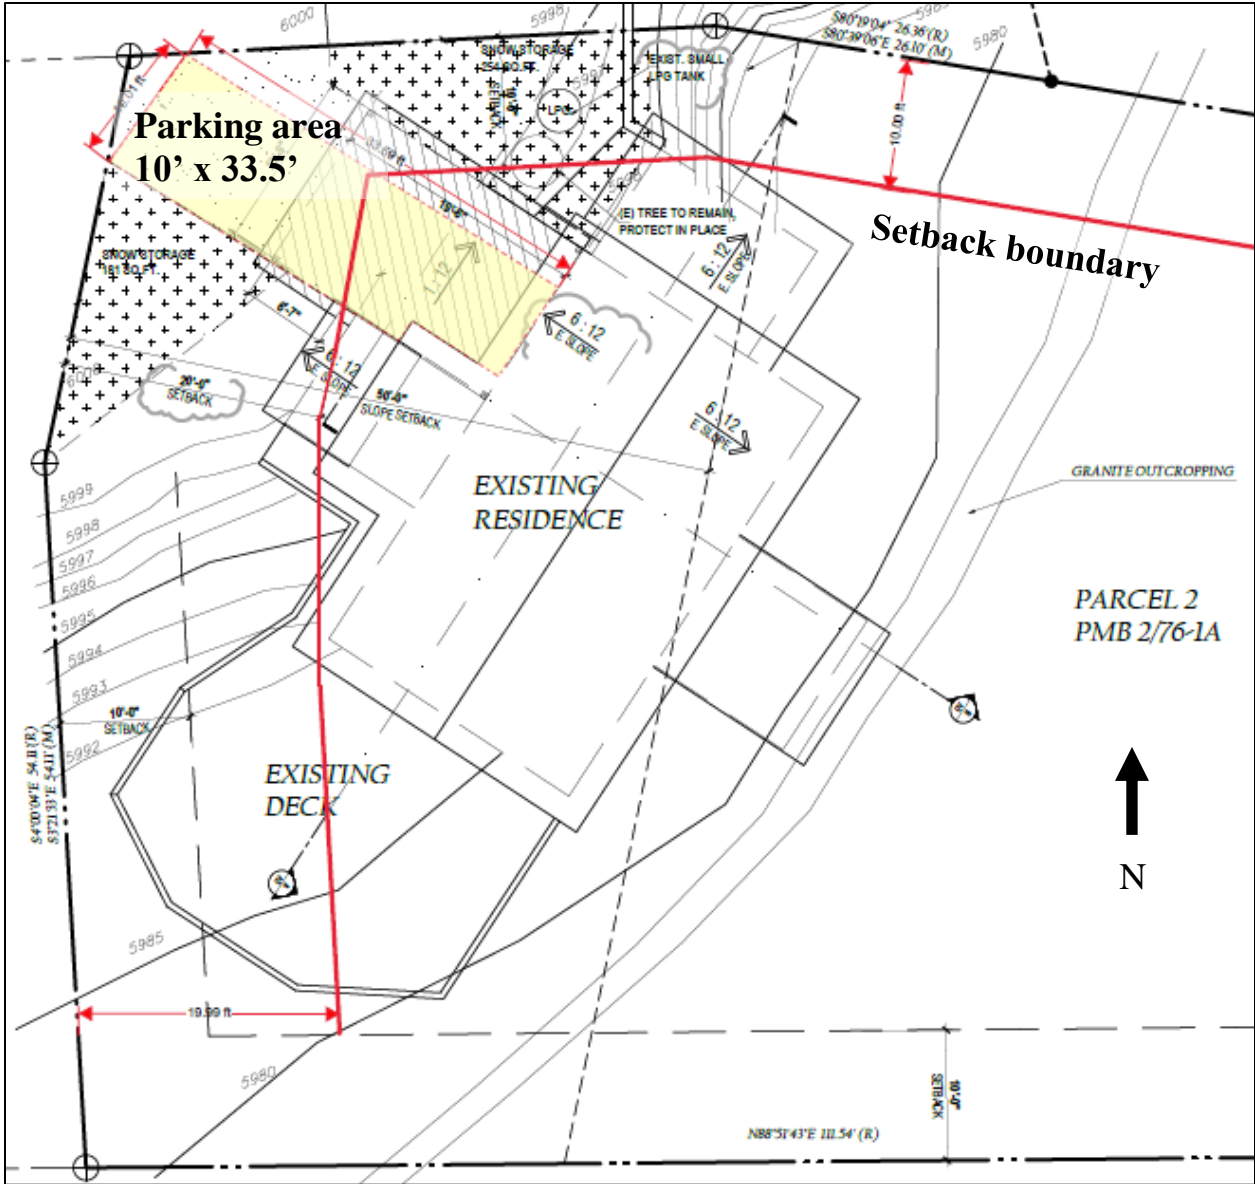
Site plan of the property displaying the current parking area and setbacks.
